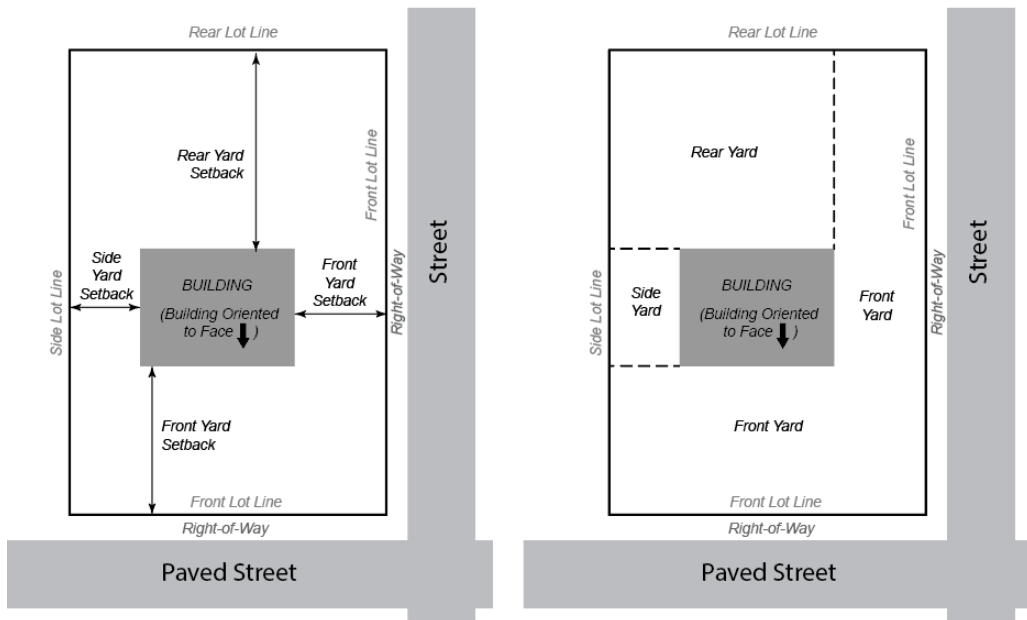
D: Typical lot lines and setback locations for a corner lot with the building oriented toward the narrow street frontage (left image) and typical yard locations (right image).
